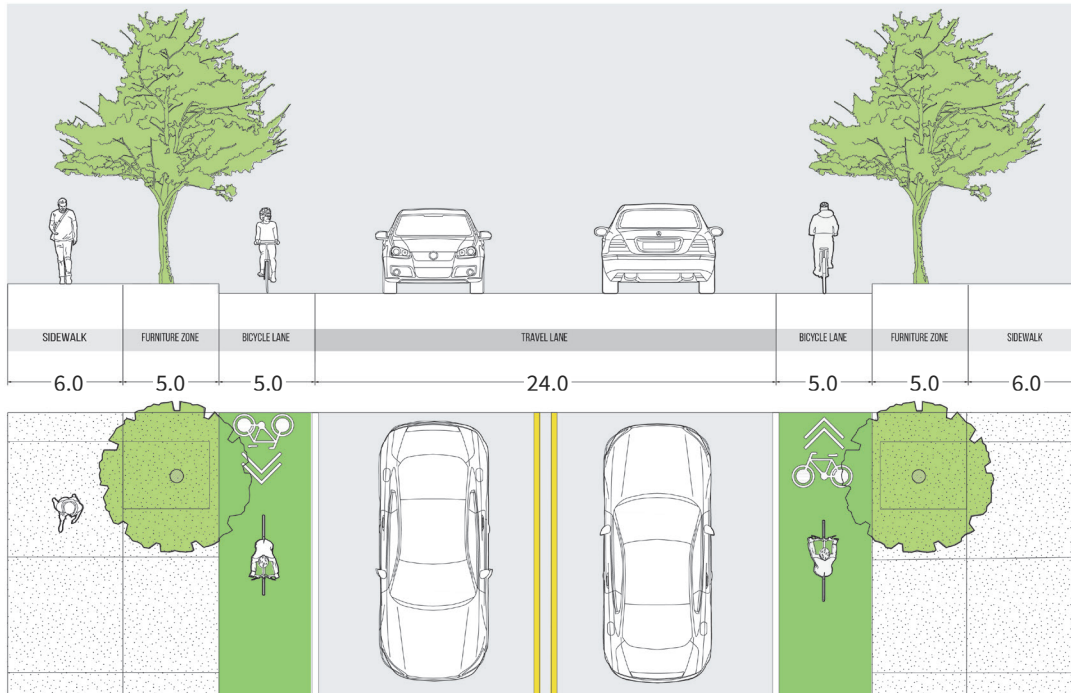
7. Typical section of a conventional bike lane, showing the travel lane, bike lane, sidewalk, frontage, and furniture zone. Courtesy of BREC.
